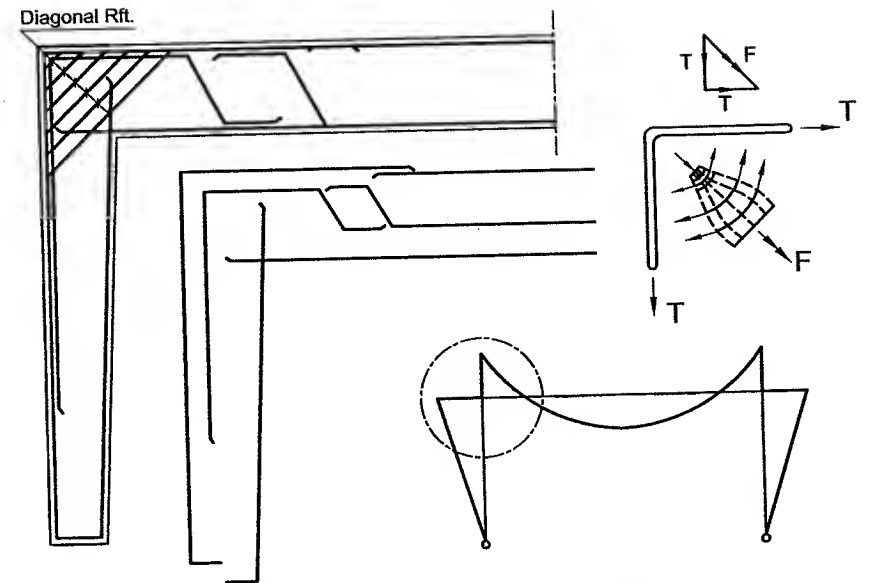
Detailing of Frame Joints (Detail-3)
